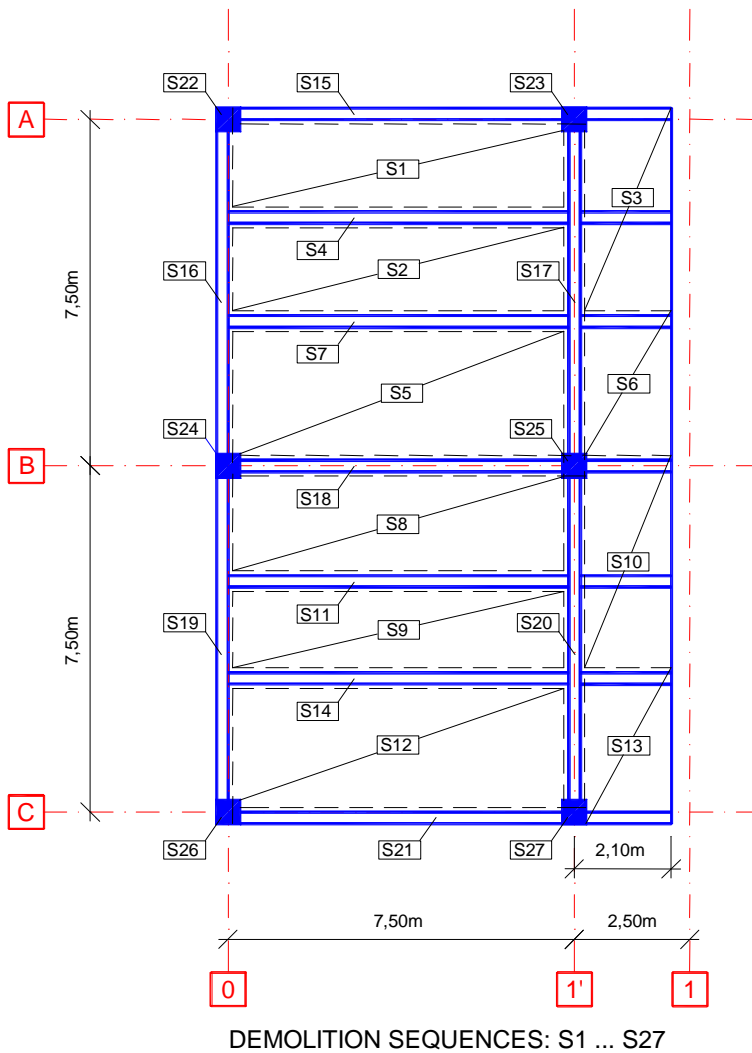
Demolition of 3<sup>rd</sup> floor.
